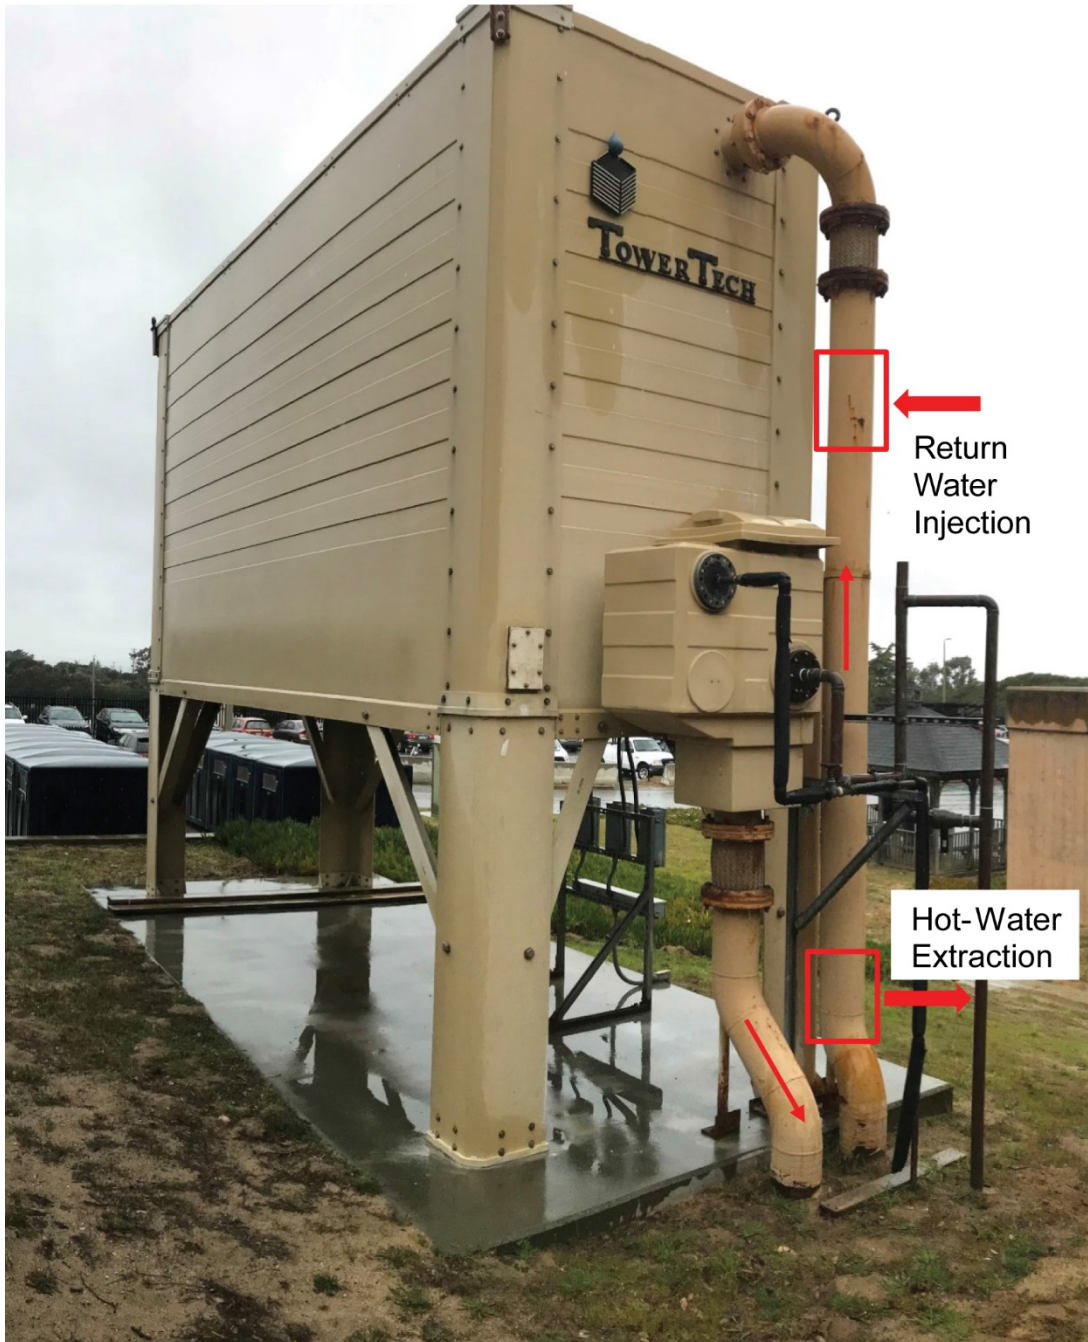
Existing cooling tower at DCMB and the proposed hot-water connection points for the demonstration equipment.
